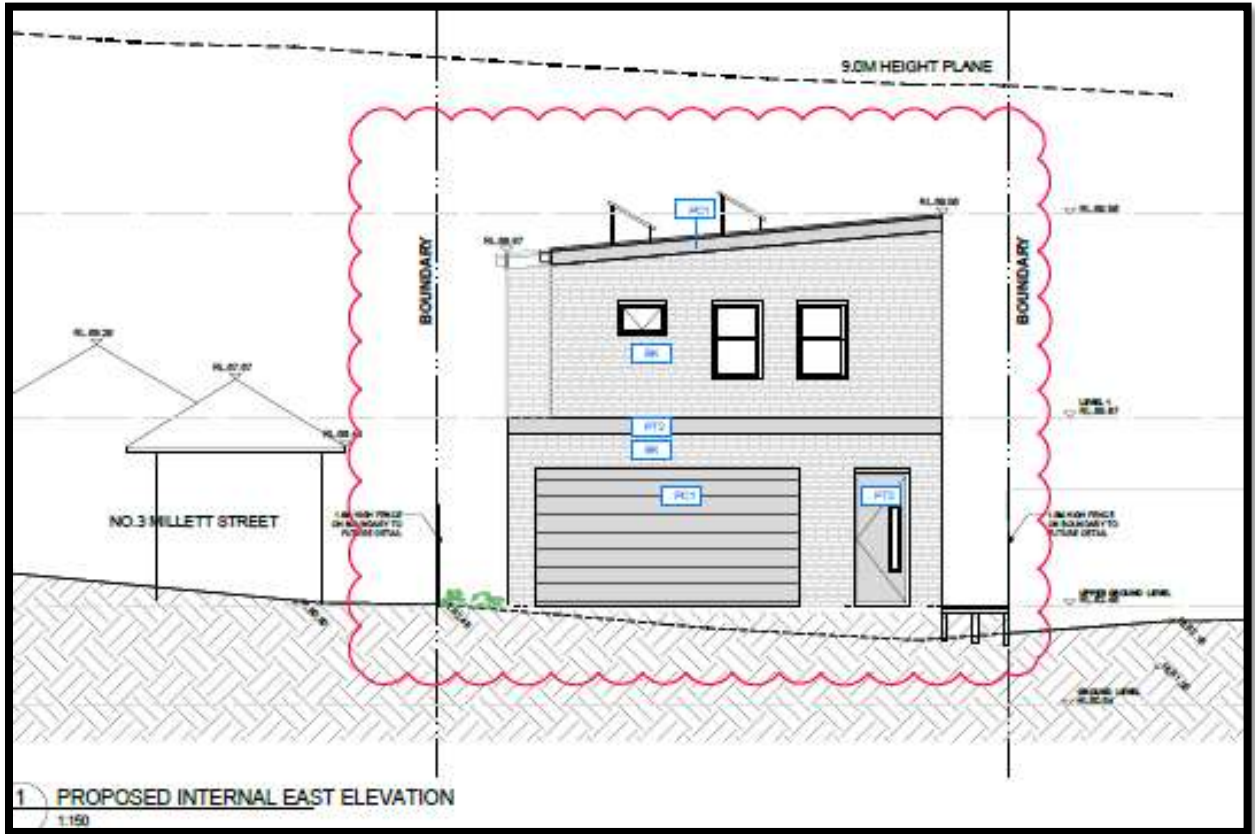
North east (front) Elevation at 5 Millett Street Hurstville (Source – Play Co Architects)
